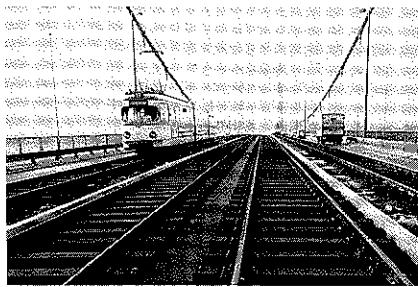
The 'four-track' Mülheimer Brücke during construction
